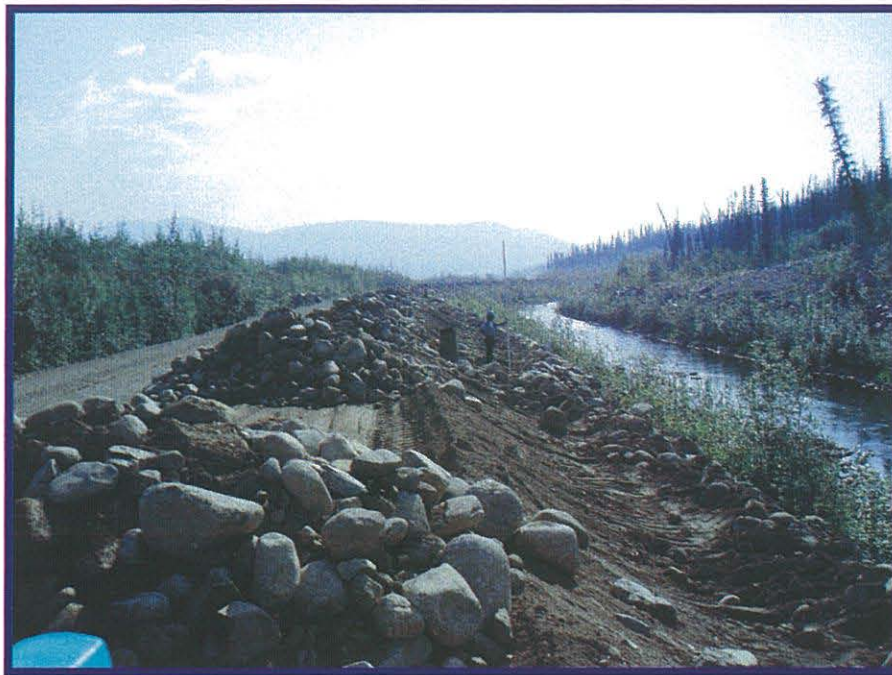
surveying the prepared surface at the RCDC riprap upgrade prior to placement. Note the stockpiles of riprap ready for placement.
